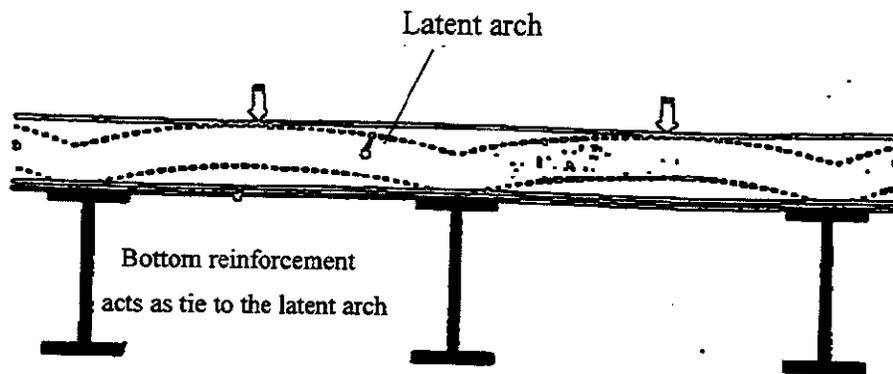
Arching action in bridge deck slab (Bakht and Mufti 1996)
